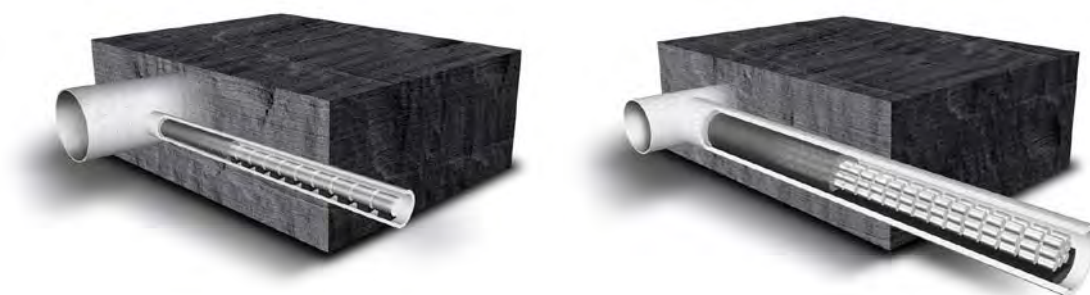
General layout of the HLW (left) and LILW (right) waste sections.
